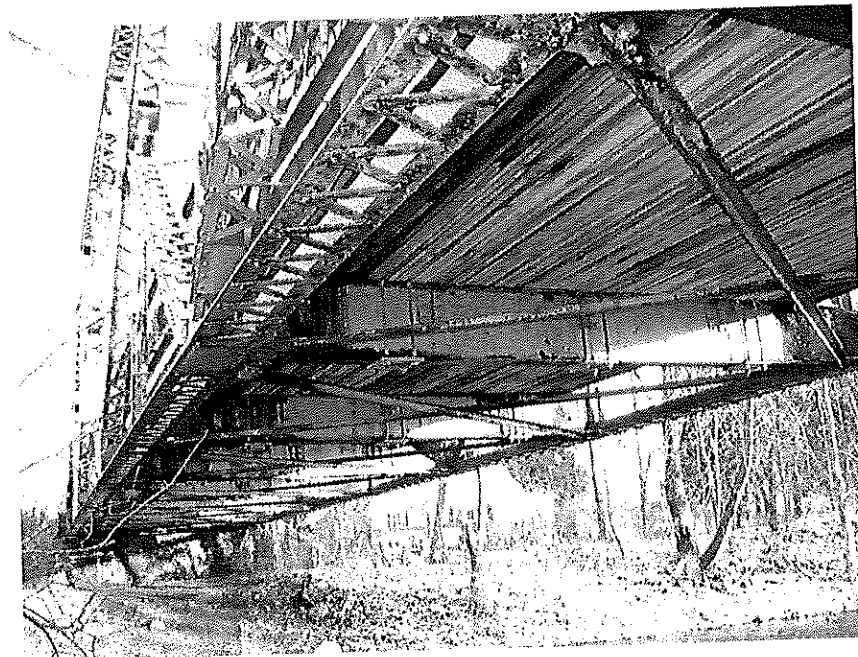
Oblique View from Northeast to Southwest below the Deck of the Collingwood Street Bridge showing Heavy Corrosion of Supporting Members
